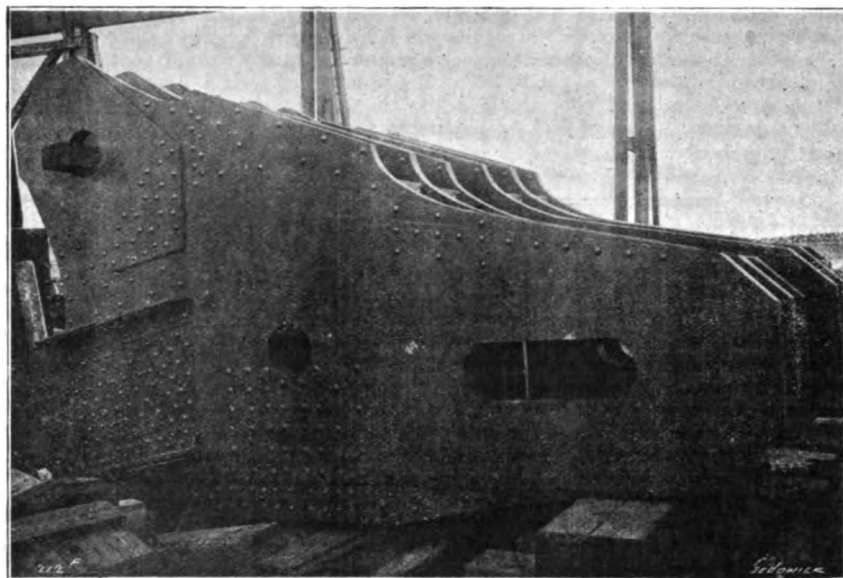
TOP CHORD CONNECTION; CENTRAL SPAN.
